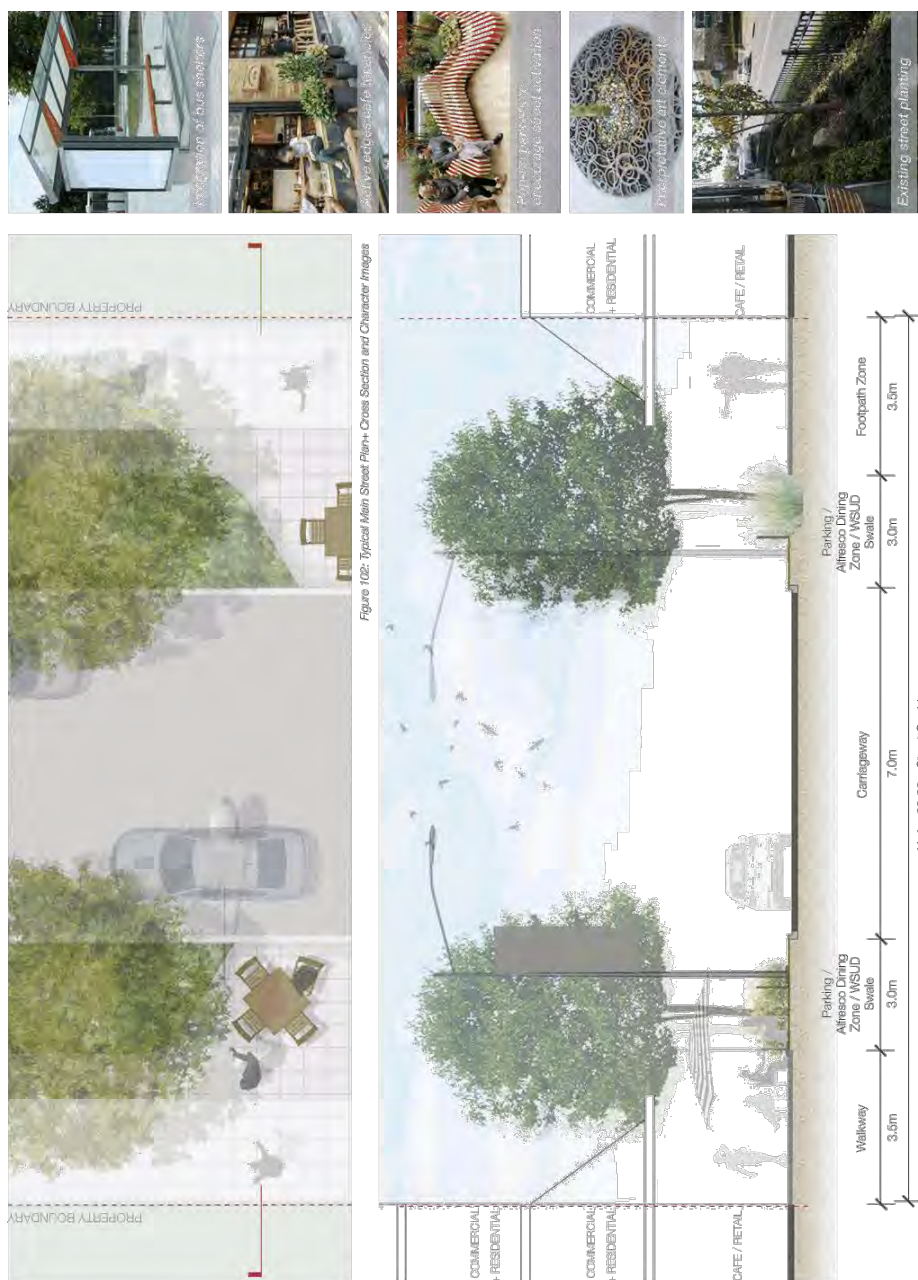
Typical Main Street Plan+ Cross Section and Character Images
